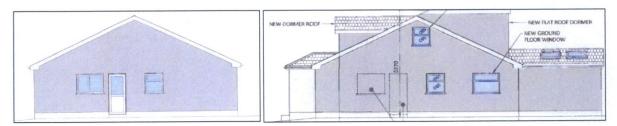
Existing side elevation and side elevation granted under Reg. Ref. SD22B/0093.
